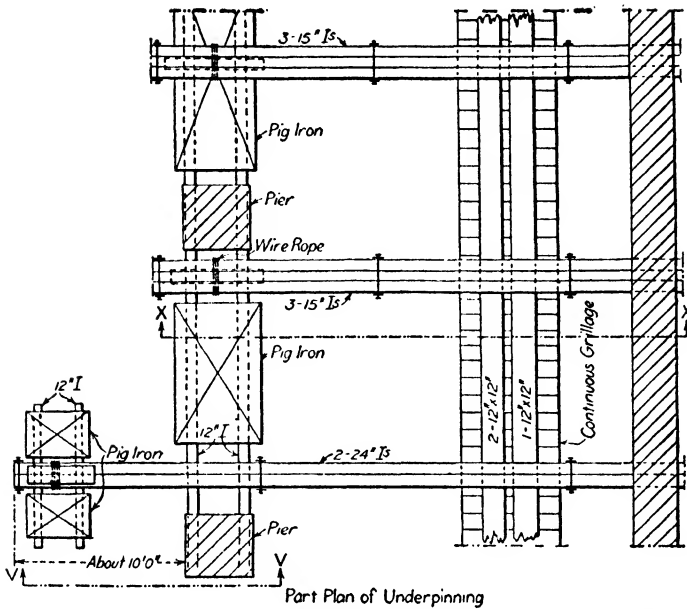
Arrangement of Underpinning, 92-94 Maiden Lane, New York City.
